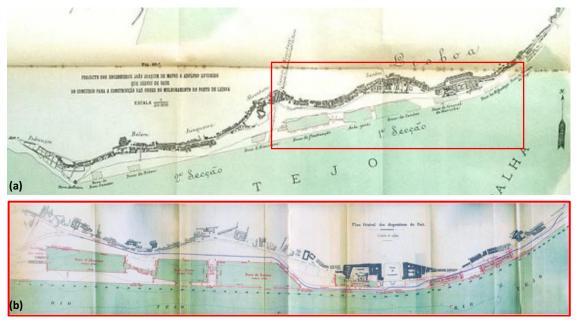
(a) Port plan developed by Loureiro and Matos in 1886 (b) Central section of the final plan developed by Hersent in 1887. Source: Pages Sanchez (2017) – author adapted.
